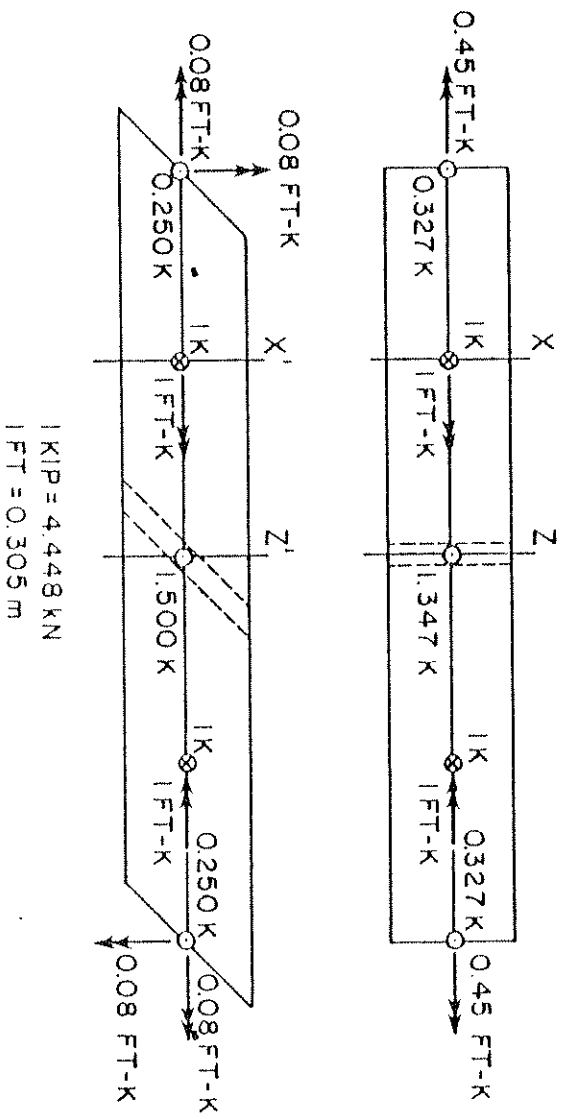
CENTERLINE REACTIONS FOR TWO SPAN STRAIGHT AND SKEW BOX GIRDERS UNDER SKEW-SYMMETRIC POINT LOADS
